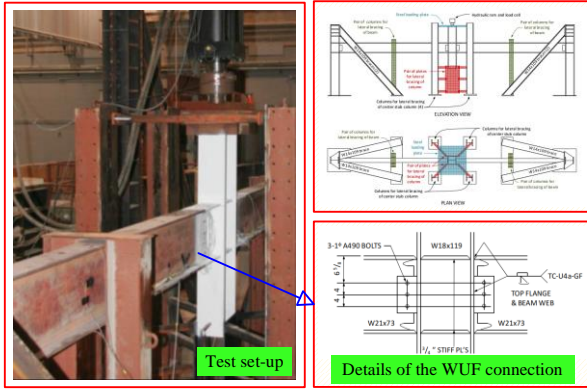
Collapse tests of beam-column assemblies with WUF connection [26] (dimension units: in)
